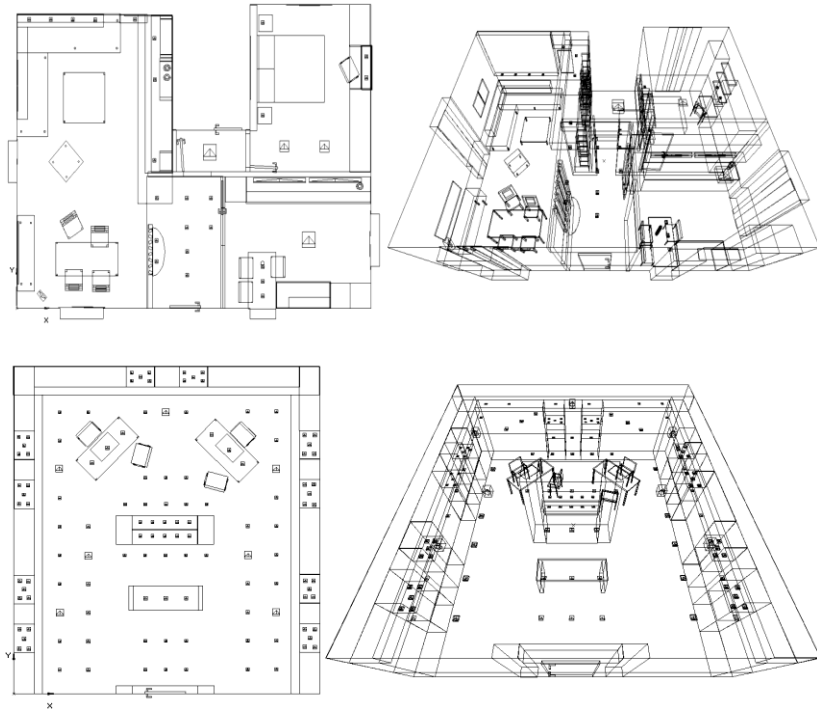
Floor plan and 3D wire-frame of the flat and shop with the arrangement of all lighting points.
